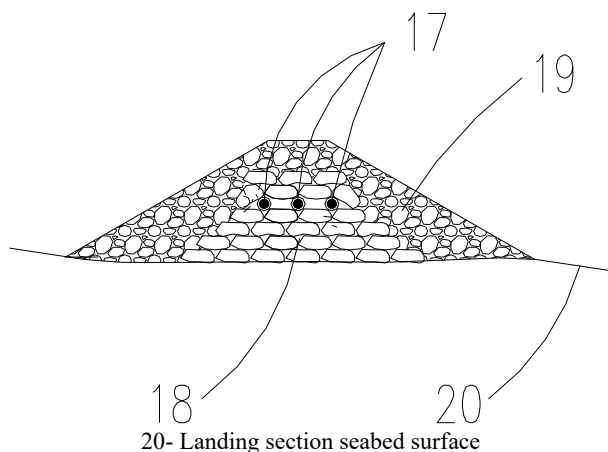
Laying and Protection Construction of Submarine Cable Landing Section in Hard Rock Layers
